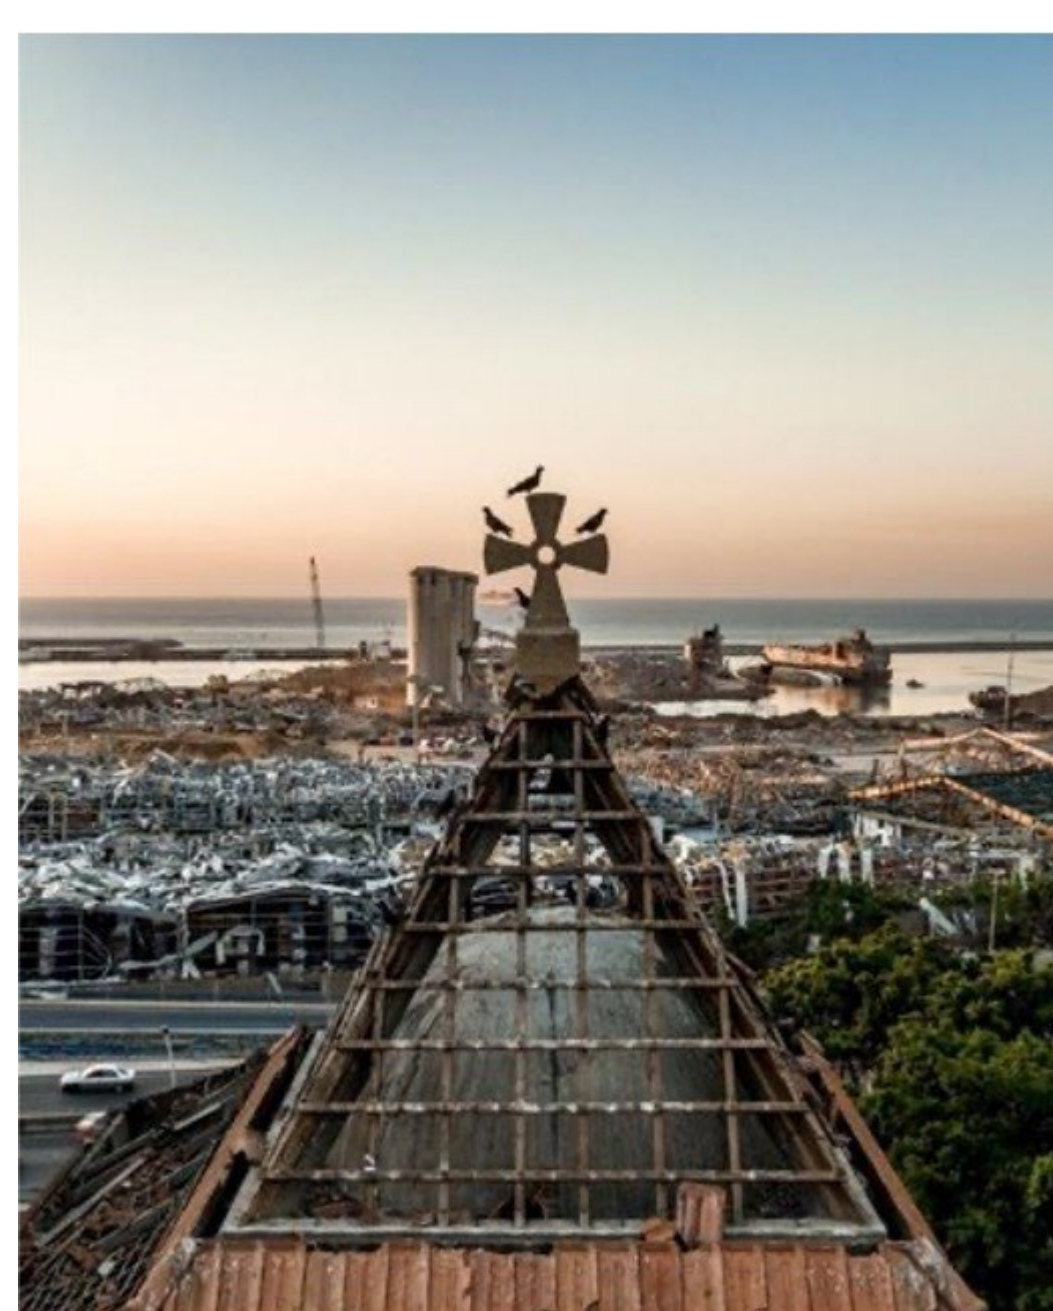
Drone image facing the port. Photo credit: Rami Rizk
